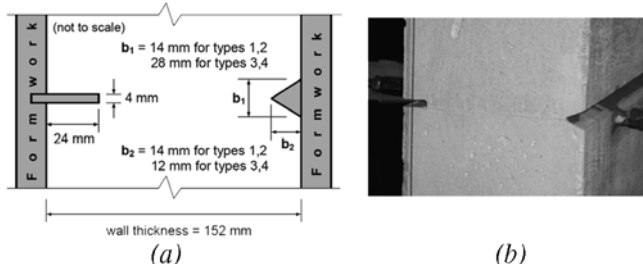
WPJ on wall spandrels: (a) WPJ detail; and (b) finished WPJ on Type 1 specimen.
